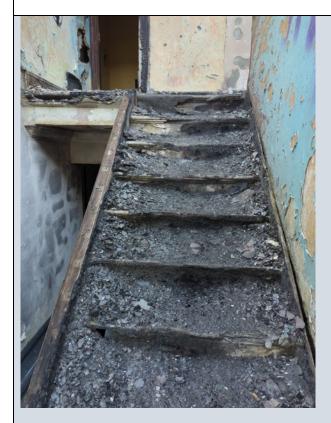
Stairs badly fire damaged and in dangerous condition
